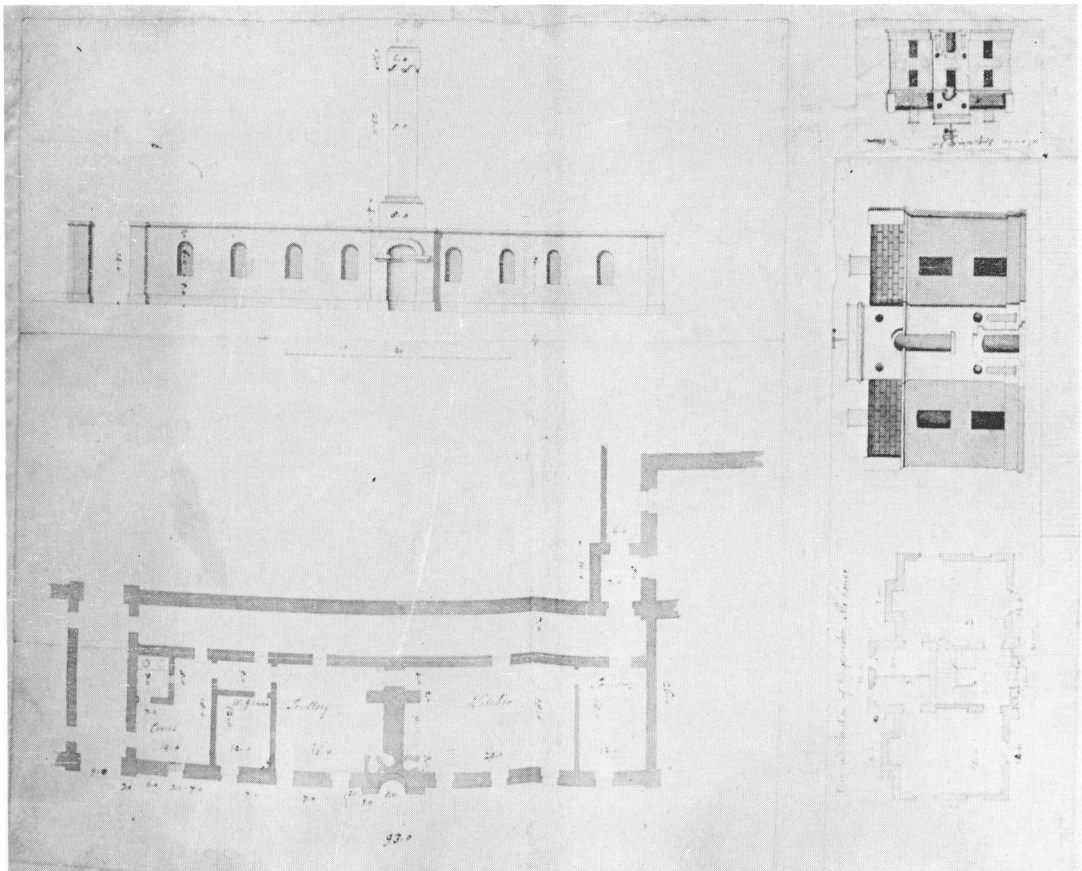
Plan and elevation of kitchen wing and designs for ale-house, Kings Weston [34-36]
